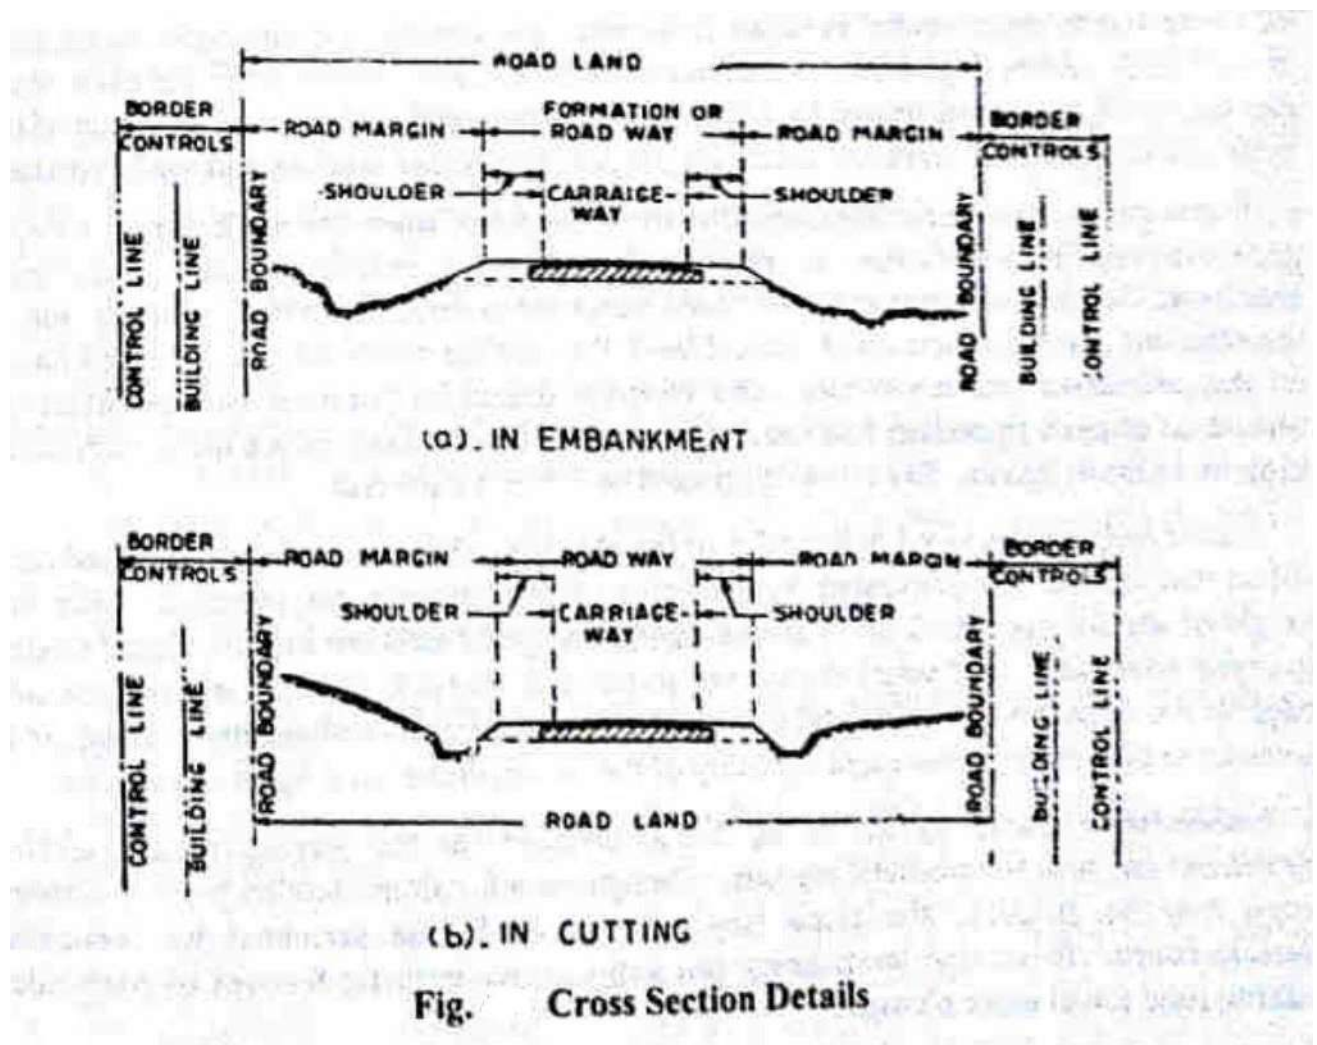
Cross section of road at filling and cutting (Highway Engineering by: Khanna and Justo)
